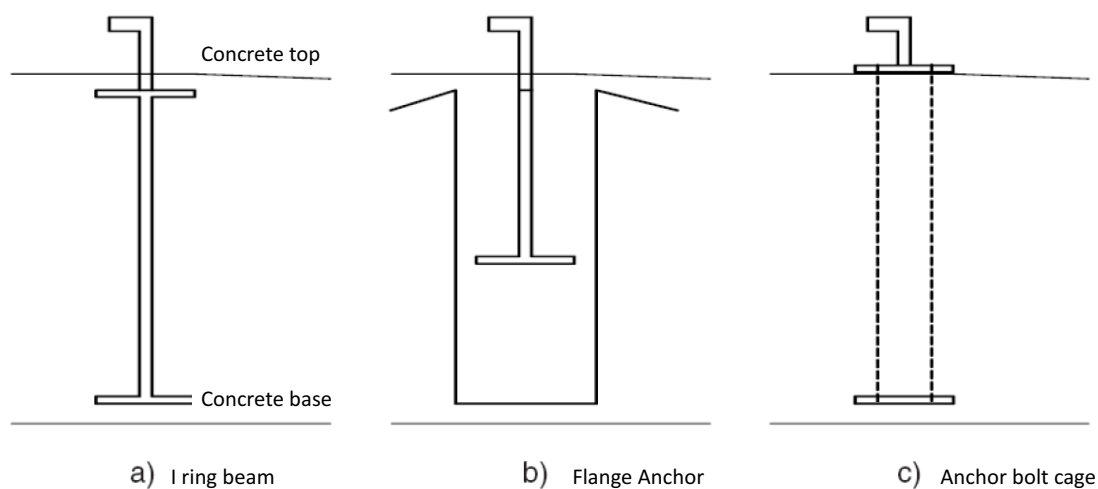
Typical construction variants for the load transfer from tower in to foundation. Adapted from Maunu (2006)
